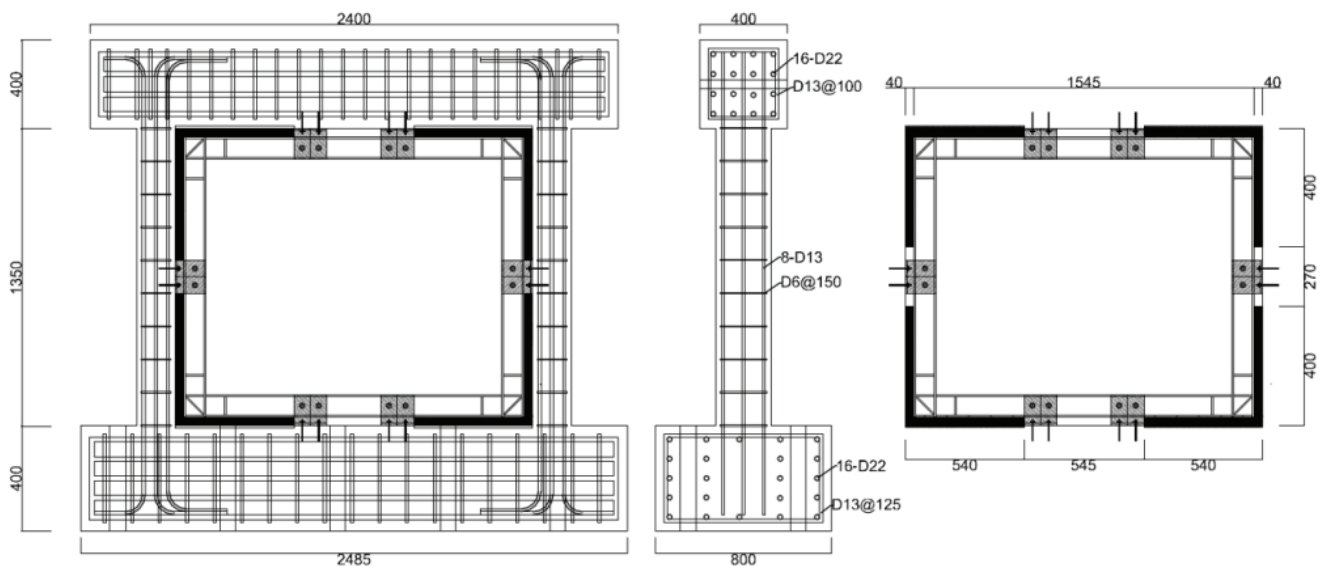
Dimensions and reinforcement details of SFR specimens (unit :mm)
